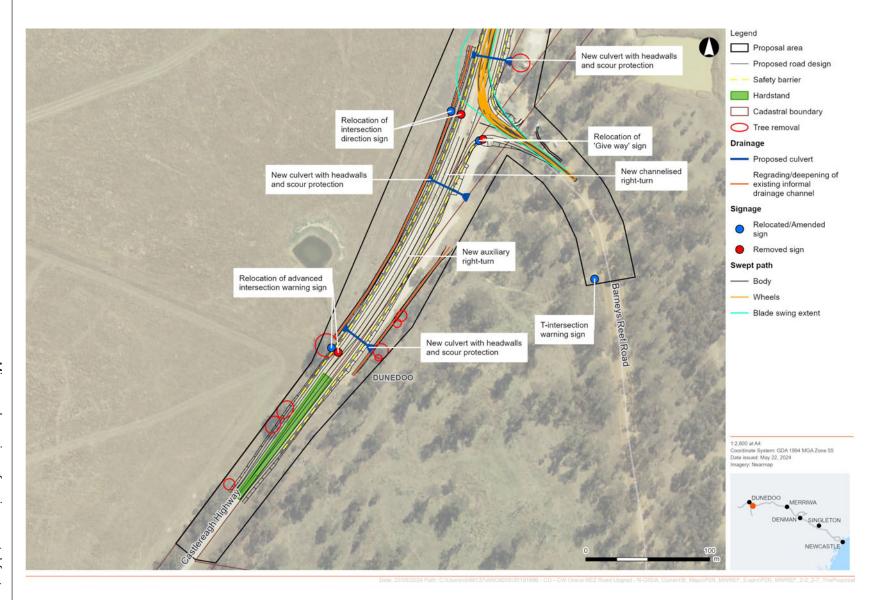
The proposal - Castlereagh Highway and Barneys Reef Road intersection (I-041), Dunedoo (Figure 2 of 2)
